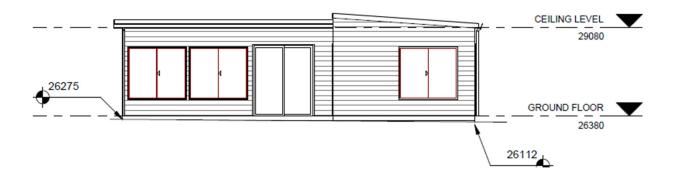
Extract of the architectural plans (elevations) showing a compliant building height.
